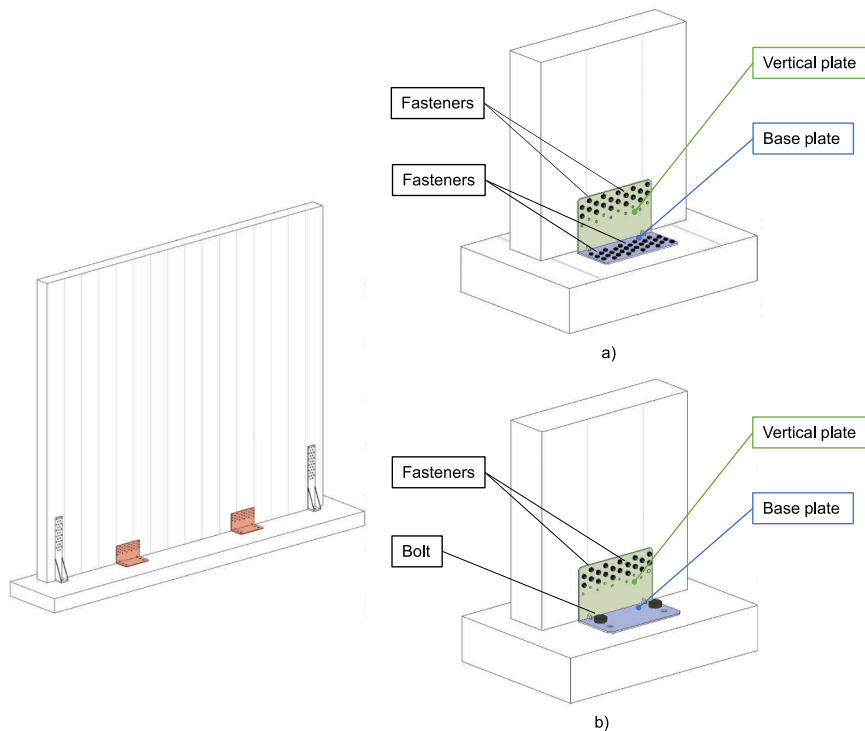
Angle brackets installed in a CLT shear wall (left), and definition of the structural components (right): a) wall-to-floor and b) wall-to-foundation joint configuration.
